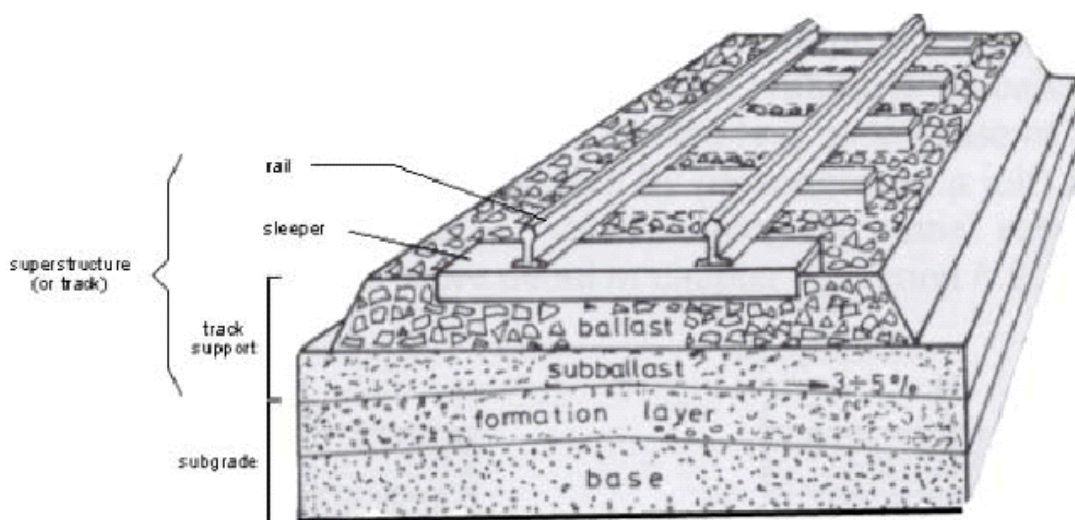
The traditional construction of a railway track sub-structure³.
